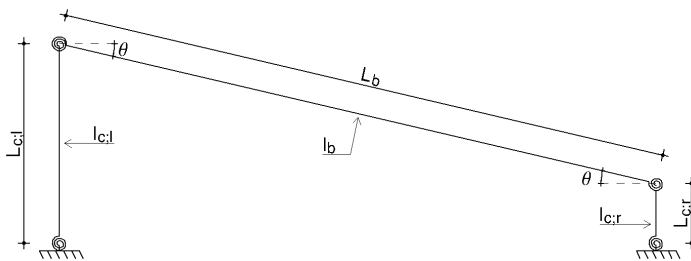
Frame 2: Non-orthogonal trapezoidal frame
